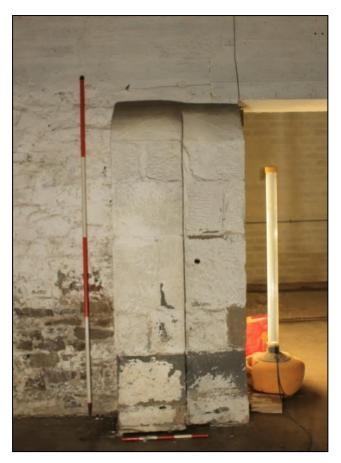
View east, showing the east end of the large southeast strongroom. 2m scales.
